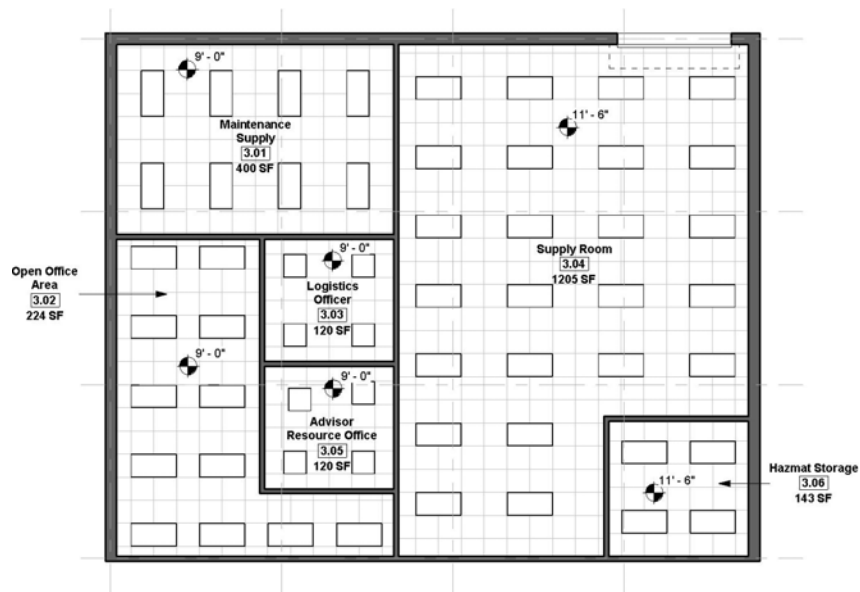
Module 3: Mobility/ Supply – Reflected Ceiling Plan
